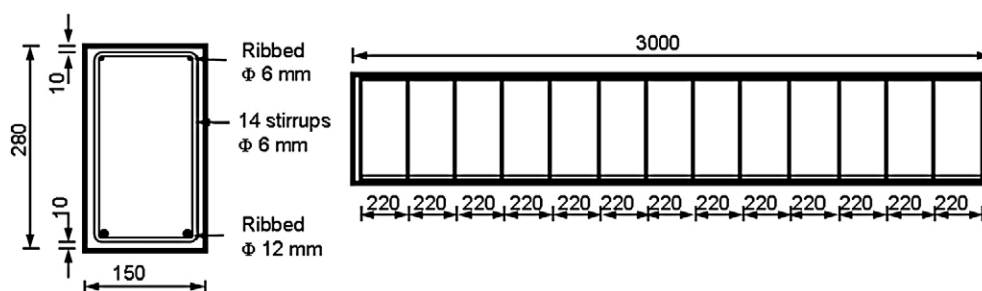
The layout of the type B beams reinforcement (all dimension in mm).
